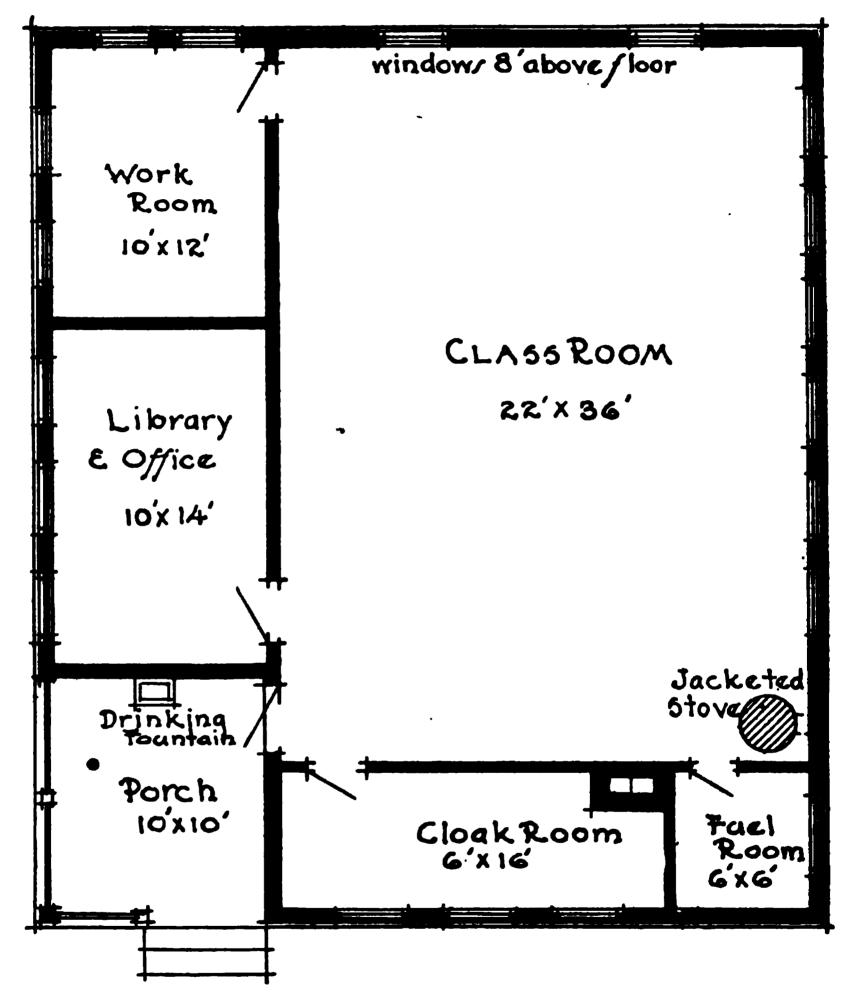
Floor plan for one-teacher rural school of minimum cost.
